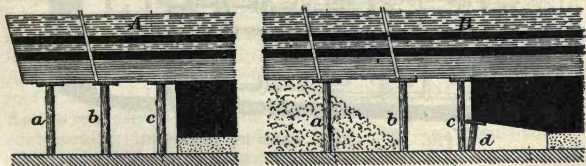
TIMBERING AT EMLY-MOOR COLLIERY.
